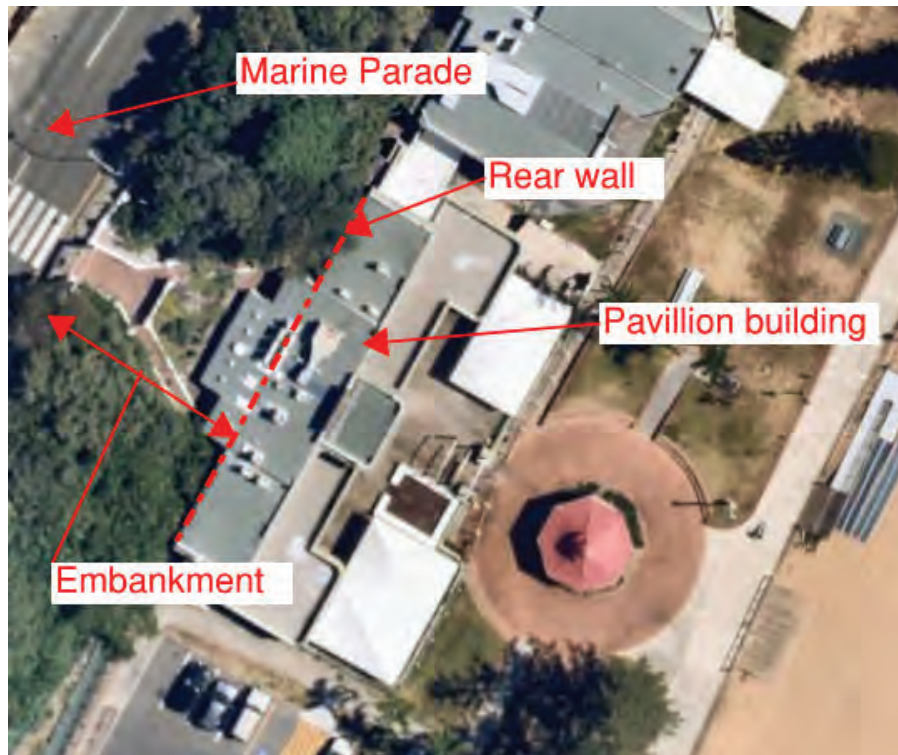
location of rear retaining wall. The wall is (approximately) 37 metres long x 3.0 metres high.
